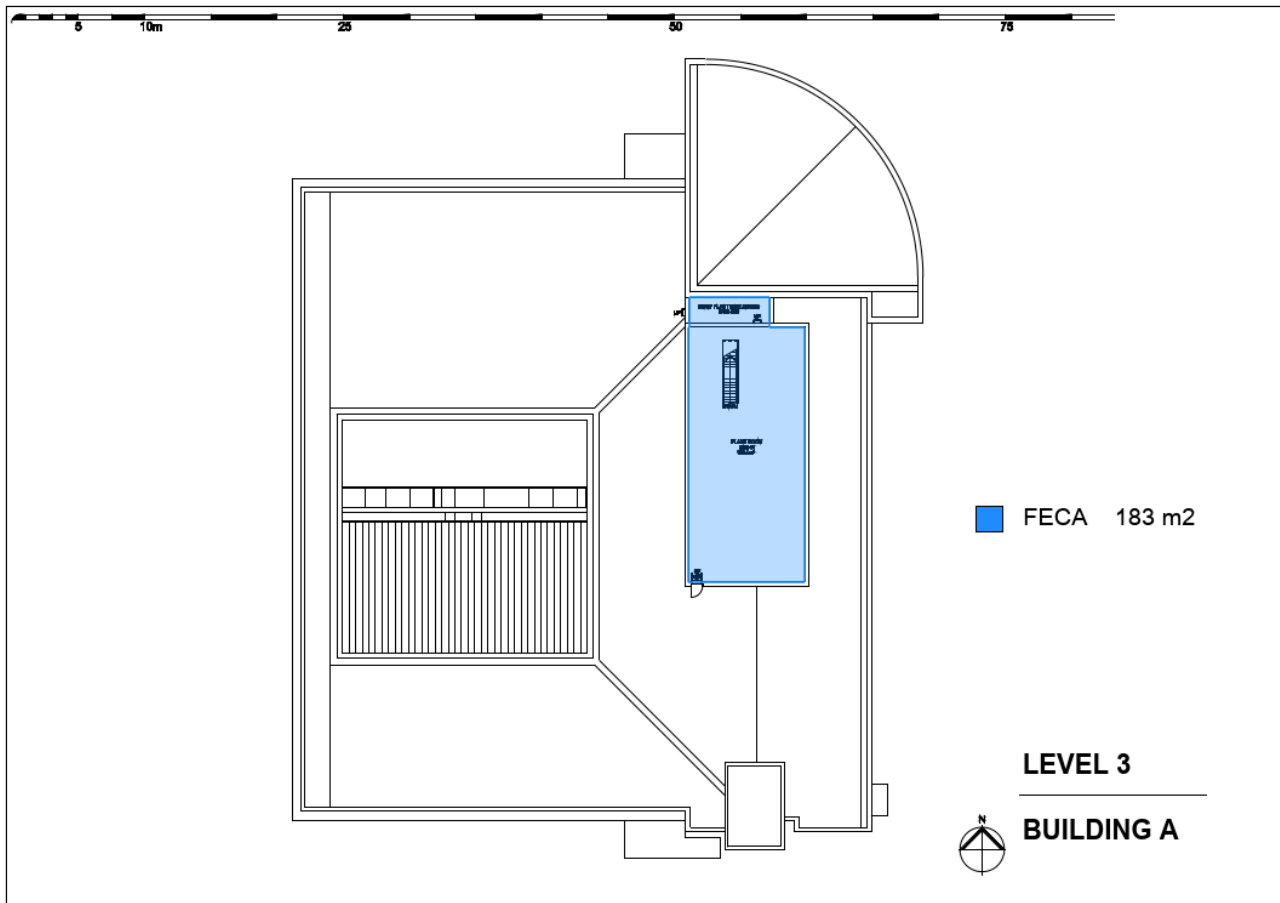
Building A – FECA – Level 3 (Roof Level)
